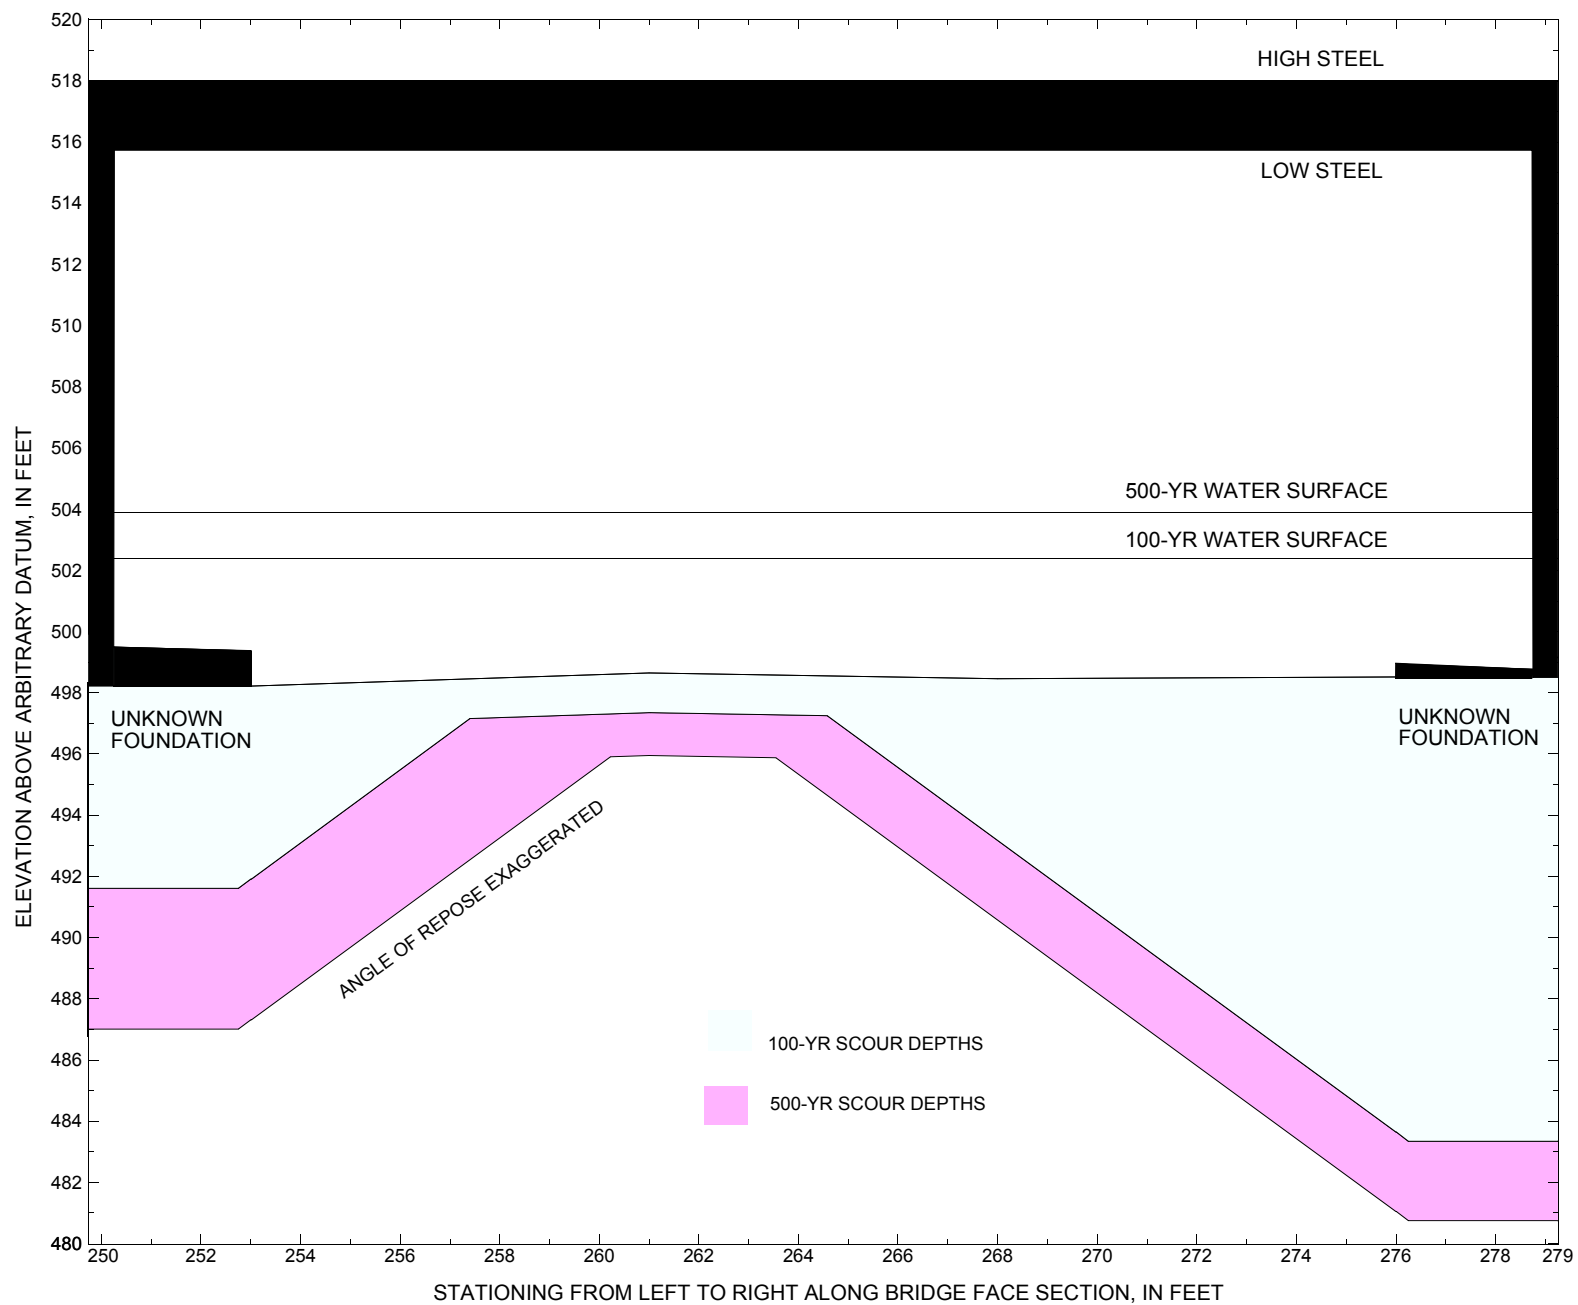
Scour elevations for the 100-yr and 500-yr discharges at structure [RANDTH00BR0054](#) on Brook Street, crossing [Thayer Brook](#), [Randolph](#), Vermont.
